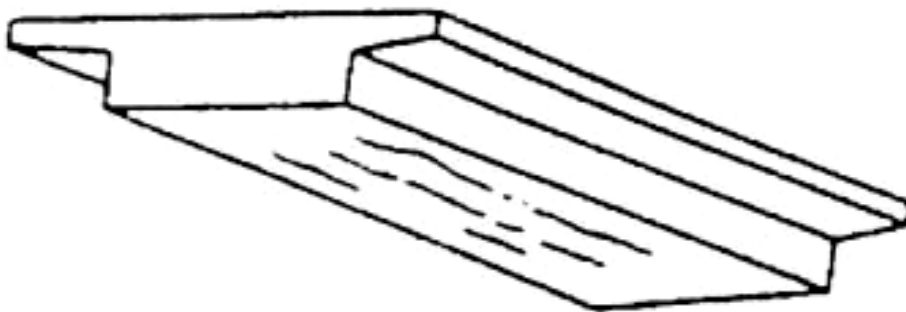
Cracks due to insufficient reinforcing bars
